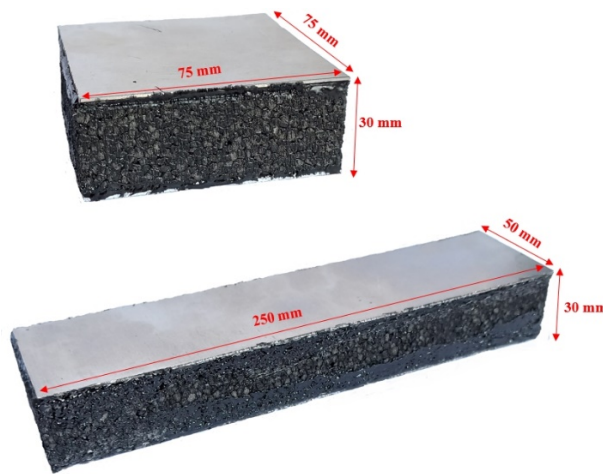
Compression and 3-Point Bending Test Specimens and Dimensions.
